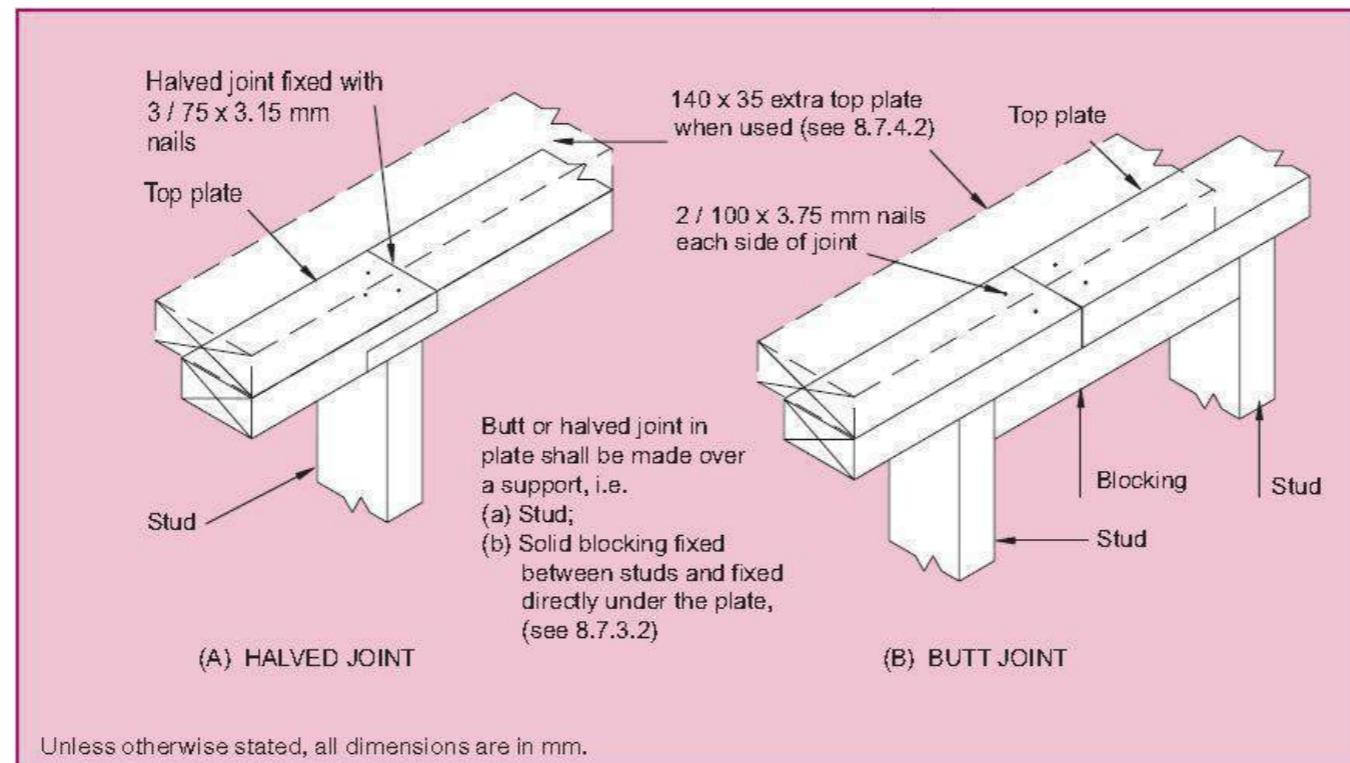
Connecting top plates – Walls not containing bracing (see 8.7.3.2)
